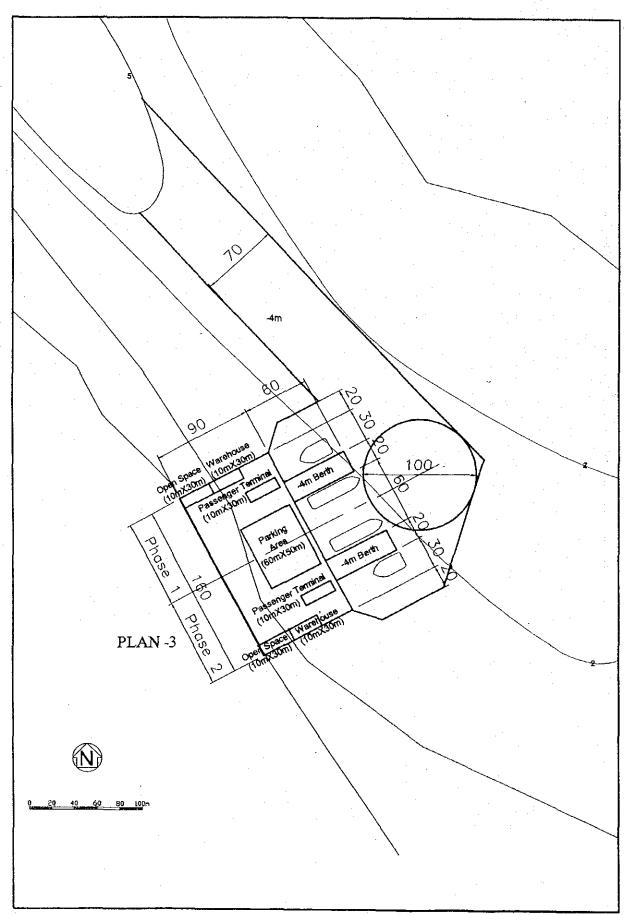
The New San Remigio Port Master Plan 3
